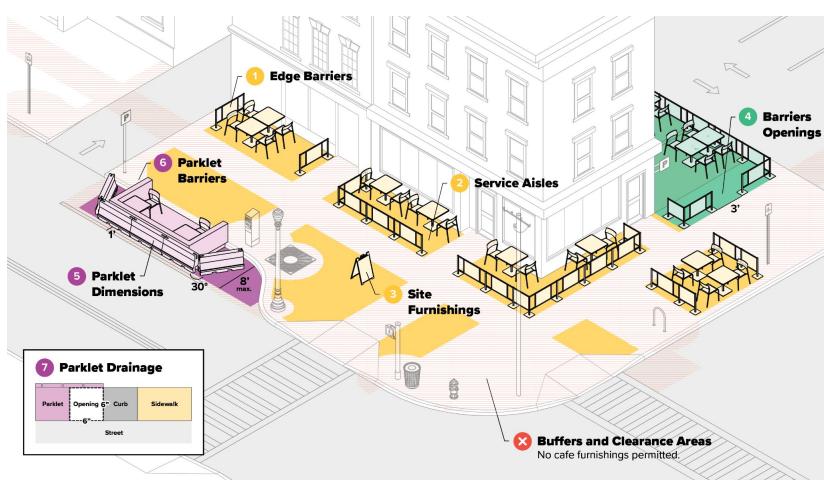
Example Outdoor Cafe Plan Drawing
